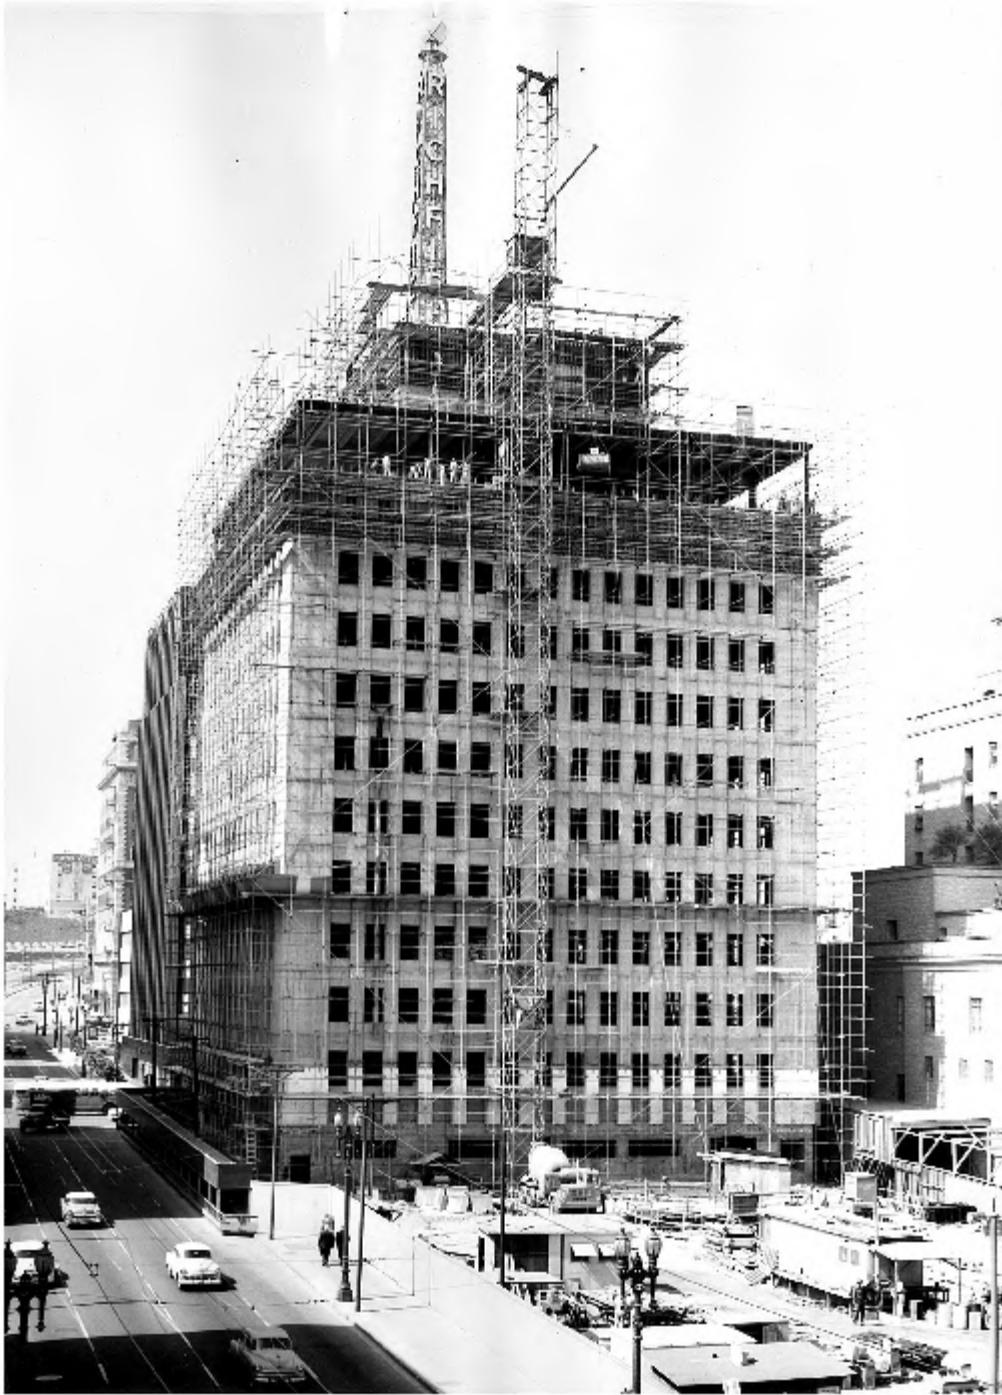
Superior under Construction showing the Concrete Sheathing Bradow Archives.
